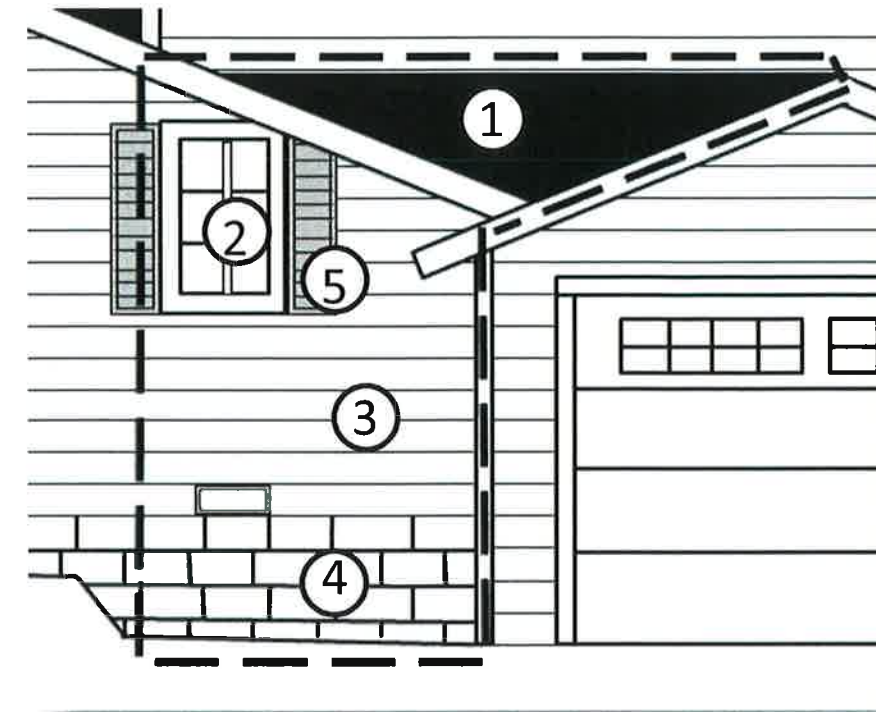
Appearance of the proposed pantry. The exterior view of the pantry would appear as a continuation of the existing west elevation of the house.
